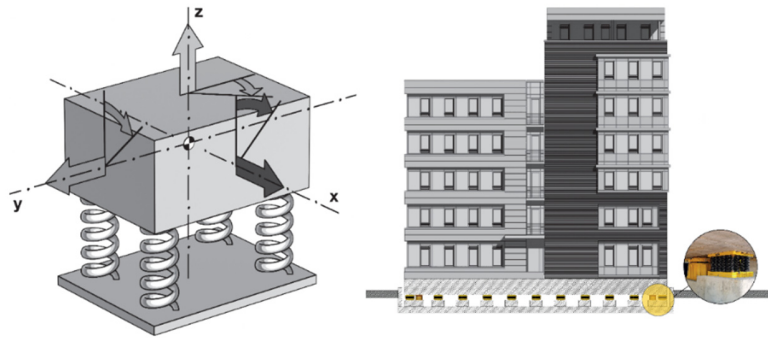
6 DOF of a “rigid” structure (left) and building supported on a 3D support system (right).
